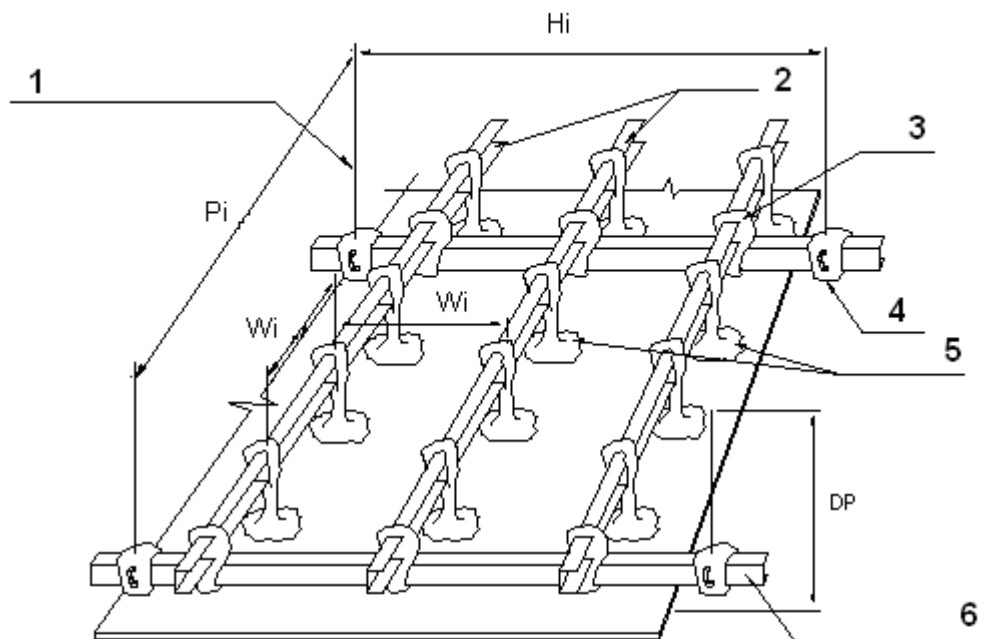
Example of installation of traditional fibrous plaster suspended ceiling (sealed system) with intermediate metal section framework
